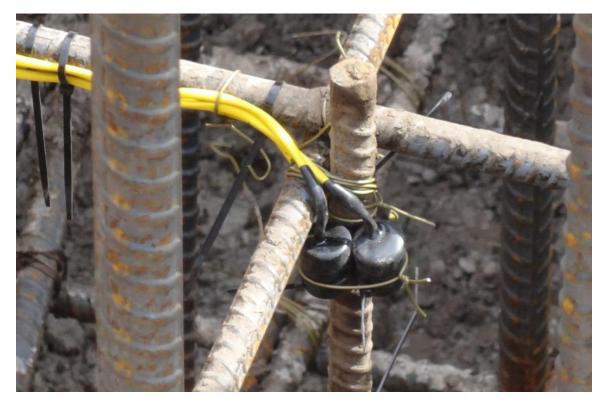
Thermal sensor supported and protected with supplemental rebar
